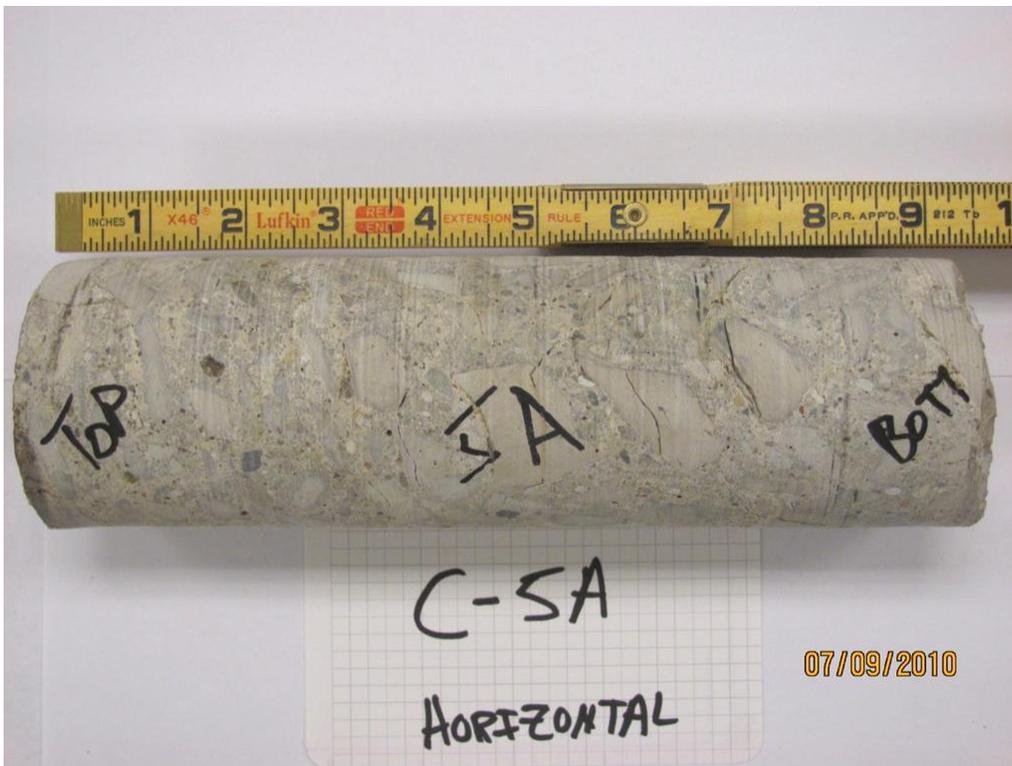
View of Core C-5A. Note cracking in the aggregate and cement paste.
